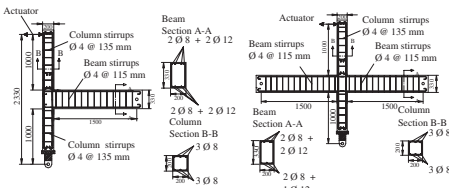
Geometry and reinforcement details in exterior joint specimen T1 and interior specimen C2.
